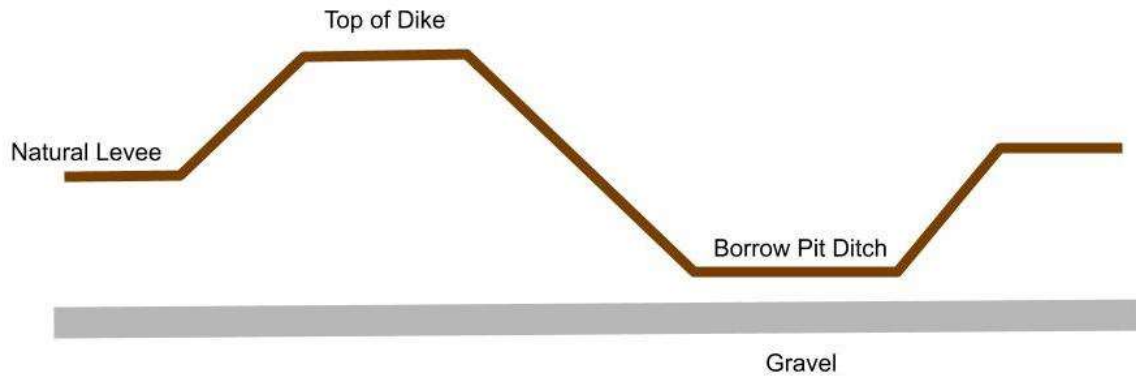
Constructed dike and borrow pit ditch (typical profile view).
